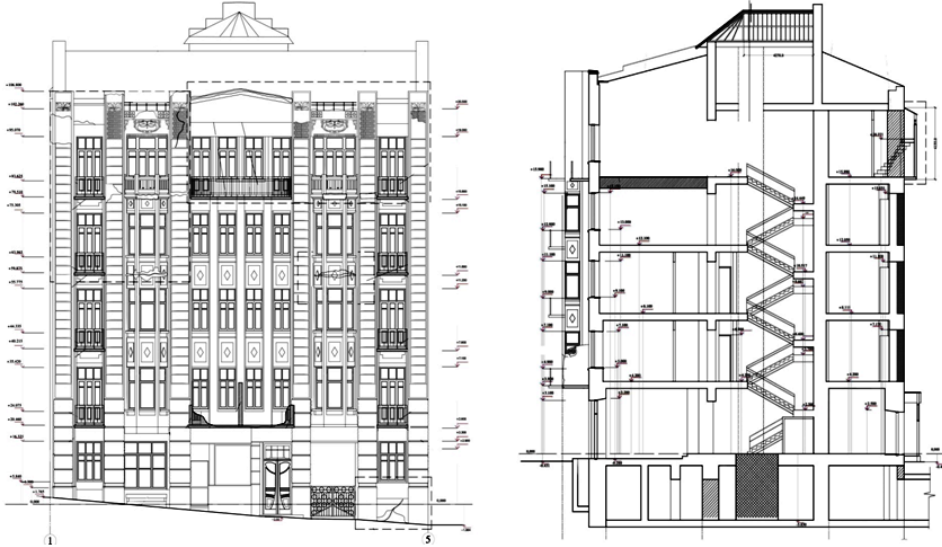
The façade and section of the building on Malaya Zhitomirskaya st., 12A, Kyiv
